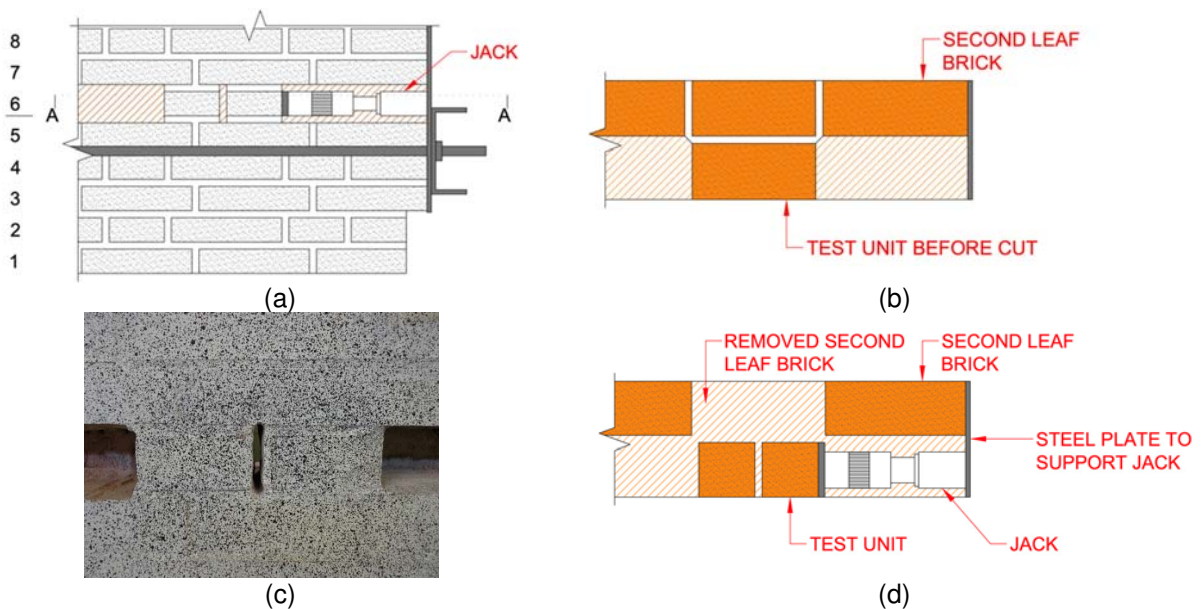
Schematics of test setup at the wall's 6th layer: a) detail of front view with A-A section position; b) temporary A-A horizontal longitudinal wall section at 6th layer after removal of only two bricks at test unit's sides; c) close-up detail of front view after removal of brick at rear leaf and after halving the test unit by a vertical groove. The surface was then prepared for optical monitoring; d) A-A horizontal wall section, showing a final brick configuration and jack insertion
